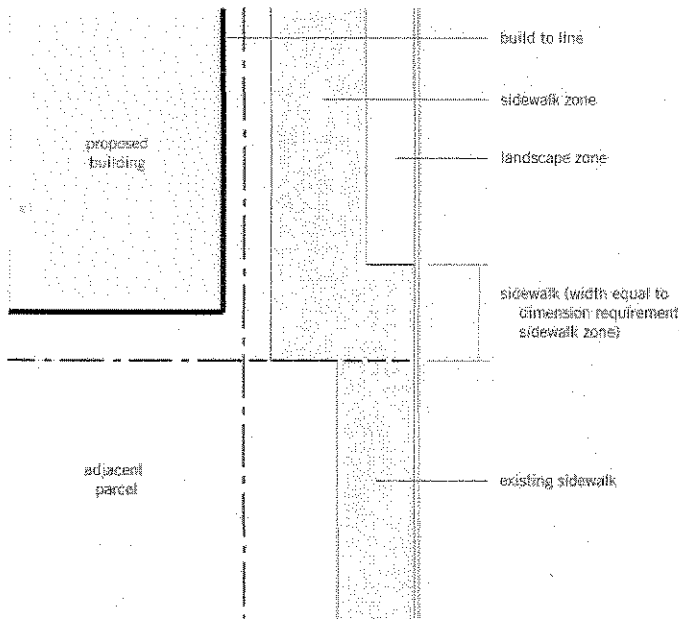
District Framework Plan - Glazing, Fig 2.8 - Sidewalk Alignment
